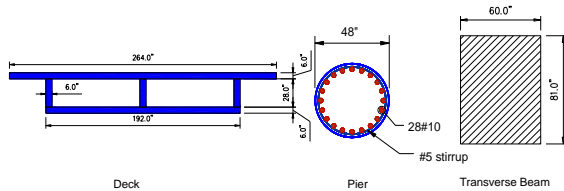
Deck, piers, and transverse beams cross sectional dimensions.
